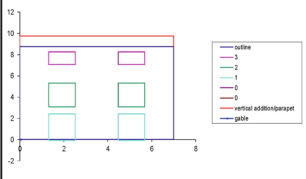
Famive electronic inspection form (D'Ayala and Novelli 2011). Example of a surveyed façade in Lorca
